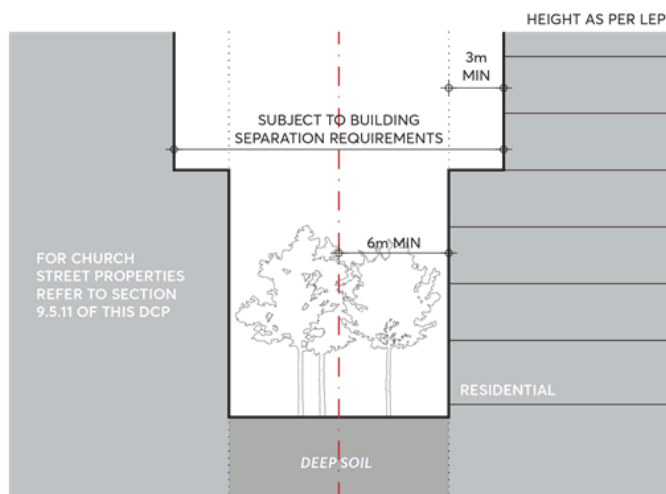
Setbacks and separation with properties fronting Church Street (site 05, site 06, site 09, and site 10)
